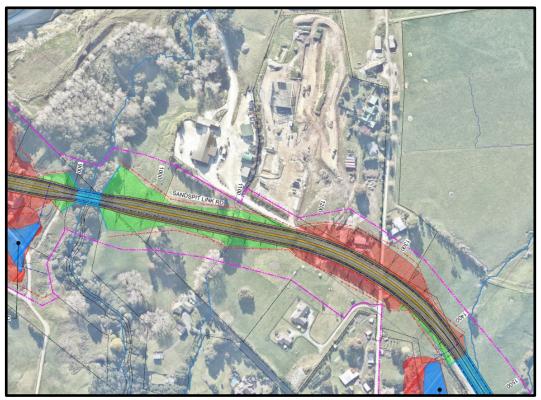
Portion of General Arrangement Plan showing how NOR7 affects 183 Sandspit Road
